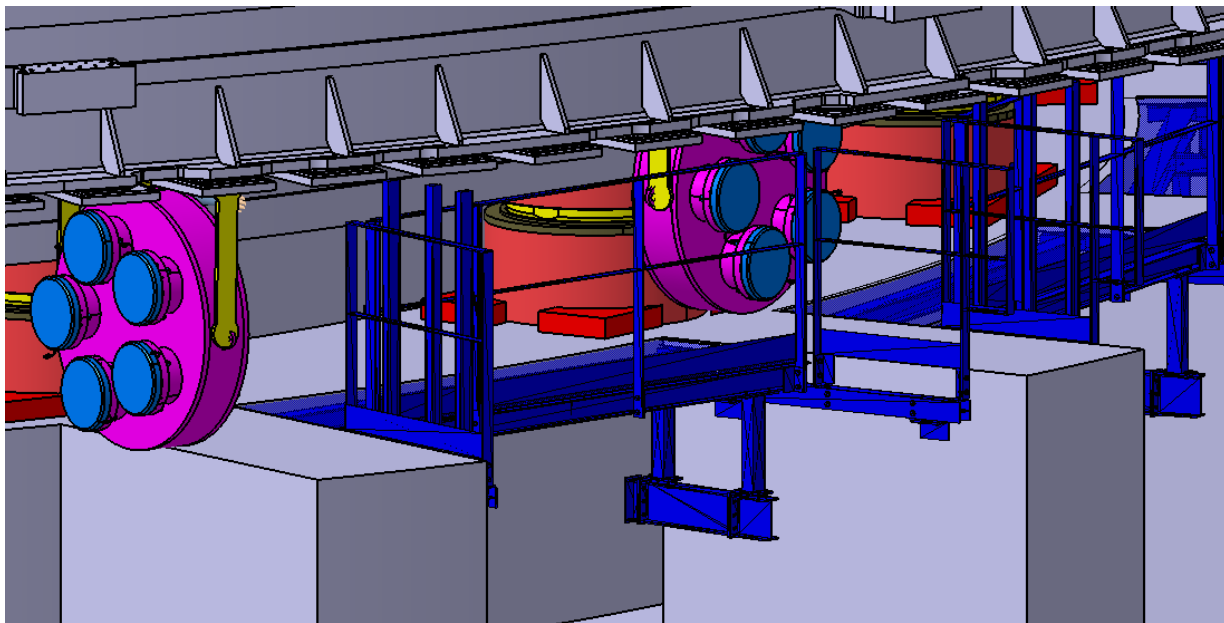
Removable platforms / in-pit mezzanine floor design in blue
